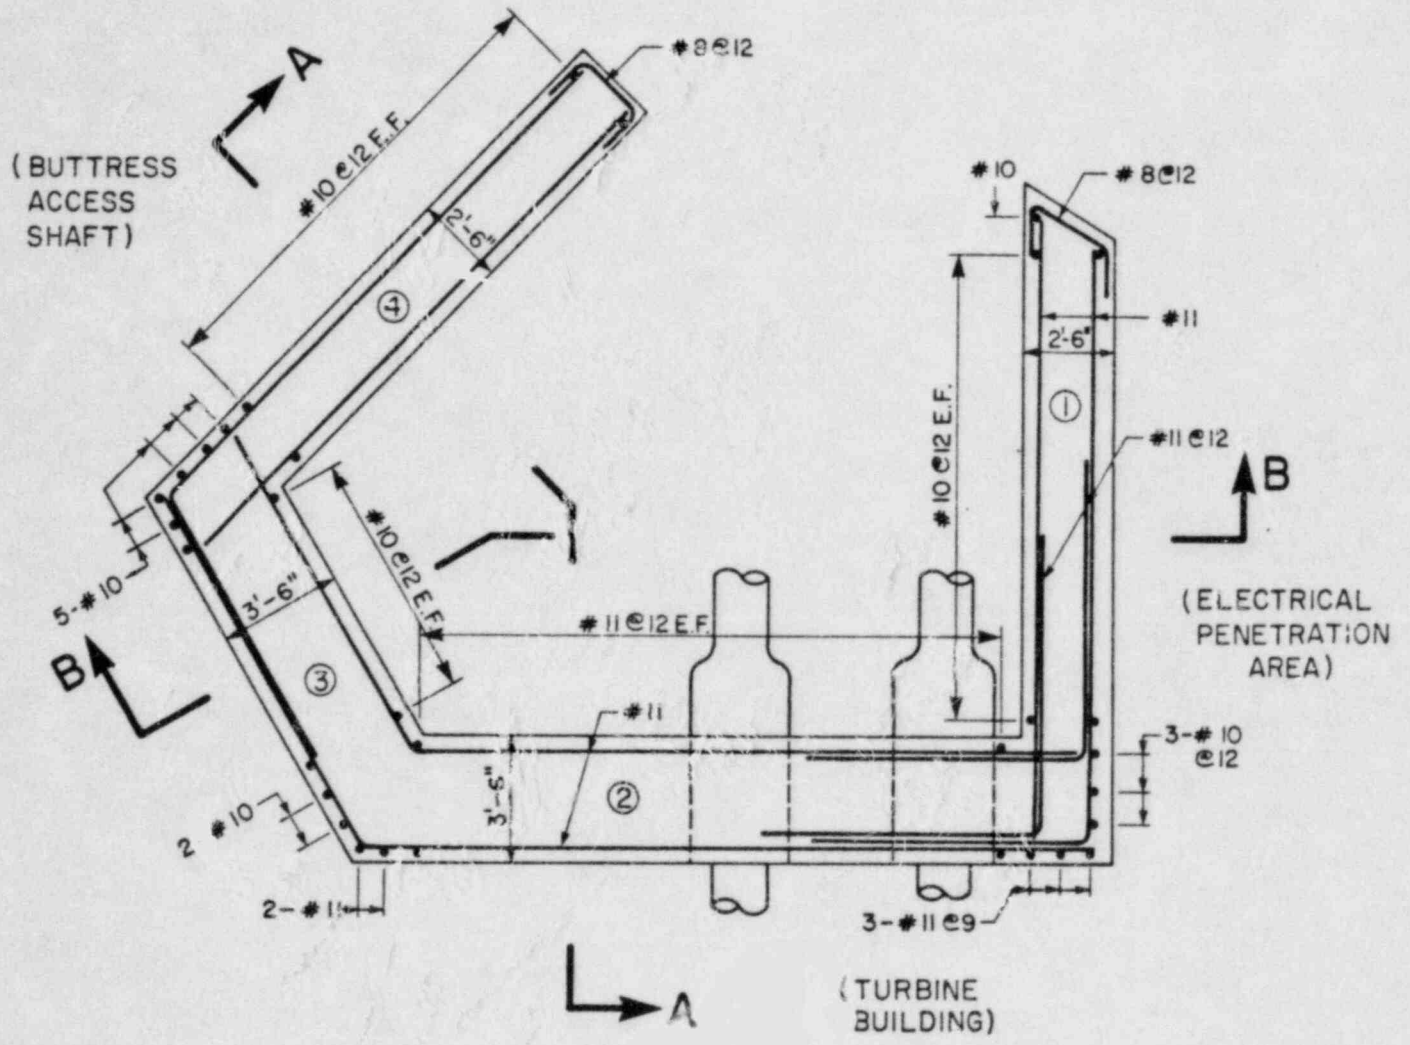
Reinforcement in Feedwater Isolation Valve Pit Walls - Plan View
